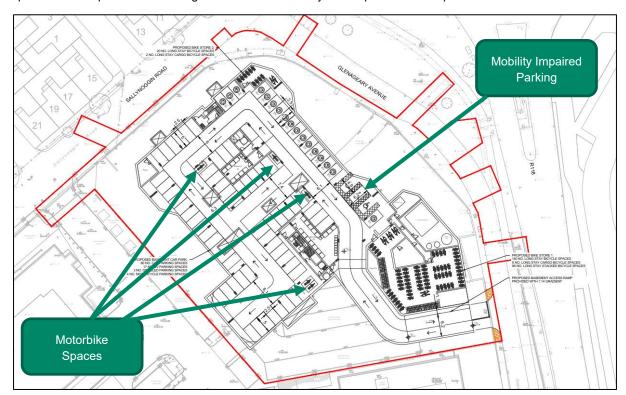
Proposed Basement Layout Indicating Motorcycle and Mobility Impaired Parking Points (AECOM Drawing: 60690914-ACM-01-00-DR-CE-10-0002)
